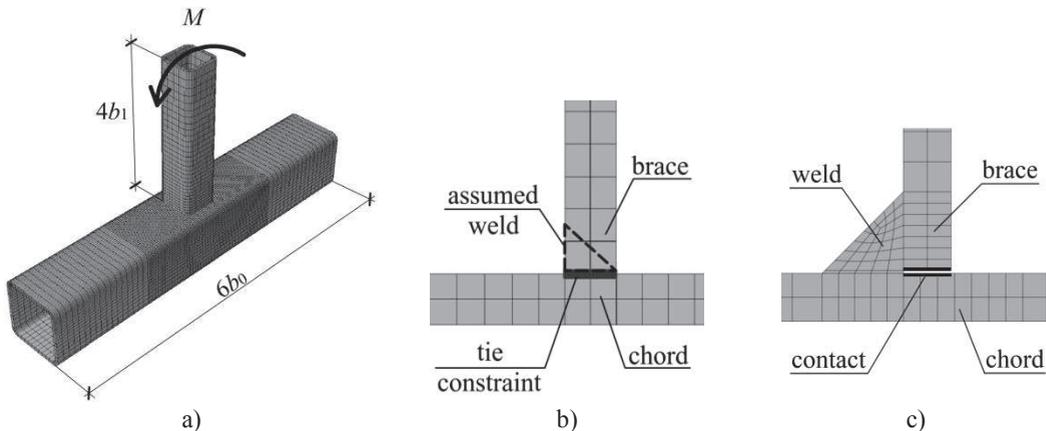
FE model: a) meshing; b) butt welds modelling, c) fillet welds modelling.
